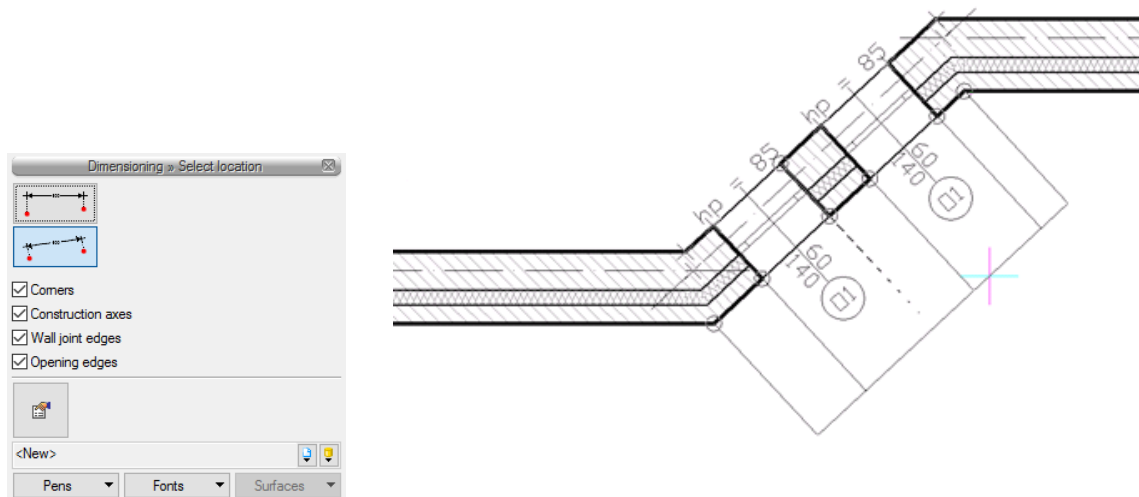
Dimensioning of the selected element with chosen dimensioning points
